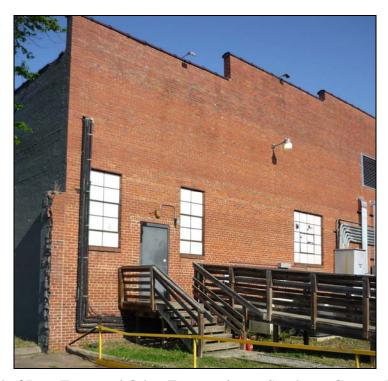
Detail of Rear Entry and Other Fenestration at Southeast Corner. Note remnant of adjacent building wall at left, now demolished.
